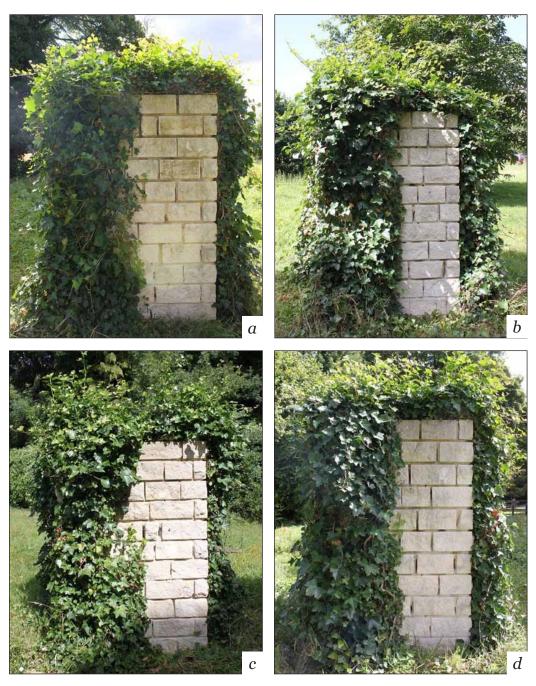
Ivy foliage and canopies on each face of the Wytham ivy wall (a: north wall, b: east wall, c: south wall, d: west wall) August 2014.
